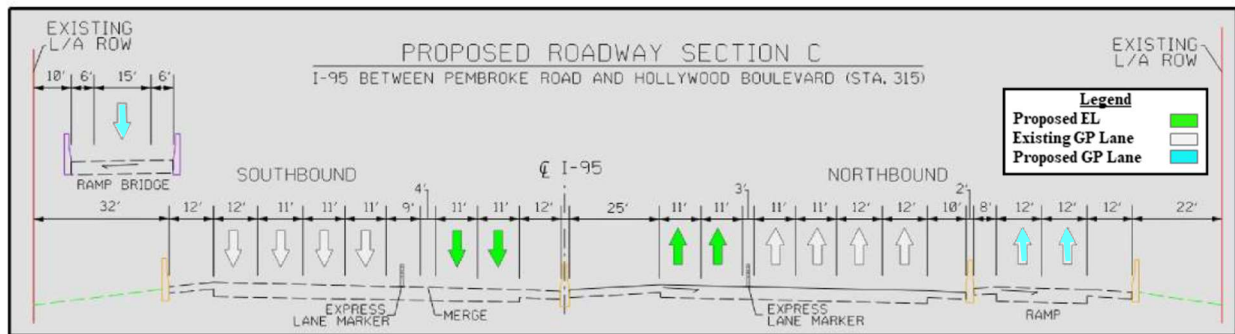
I-95 Roadway Section C - between Pembroke Road and Hollywood Blvd.
